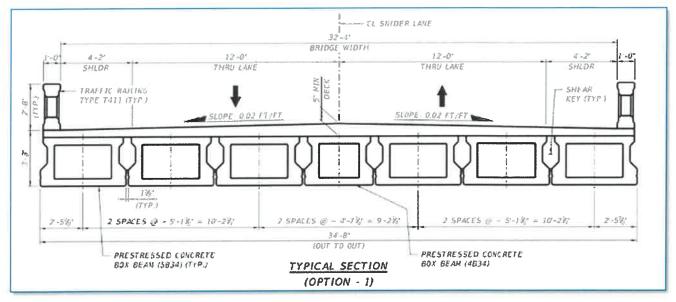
TxDOT Prestressed Concrete Box Beams (5B34 & 4B34) Typical Section
